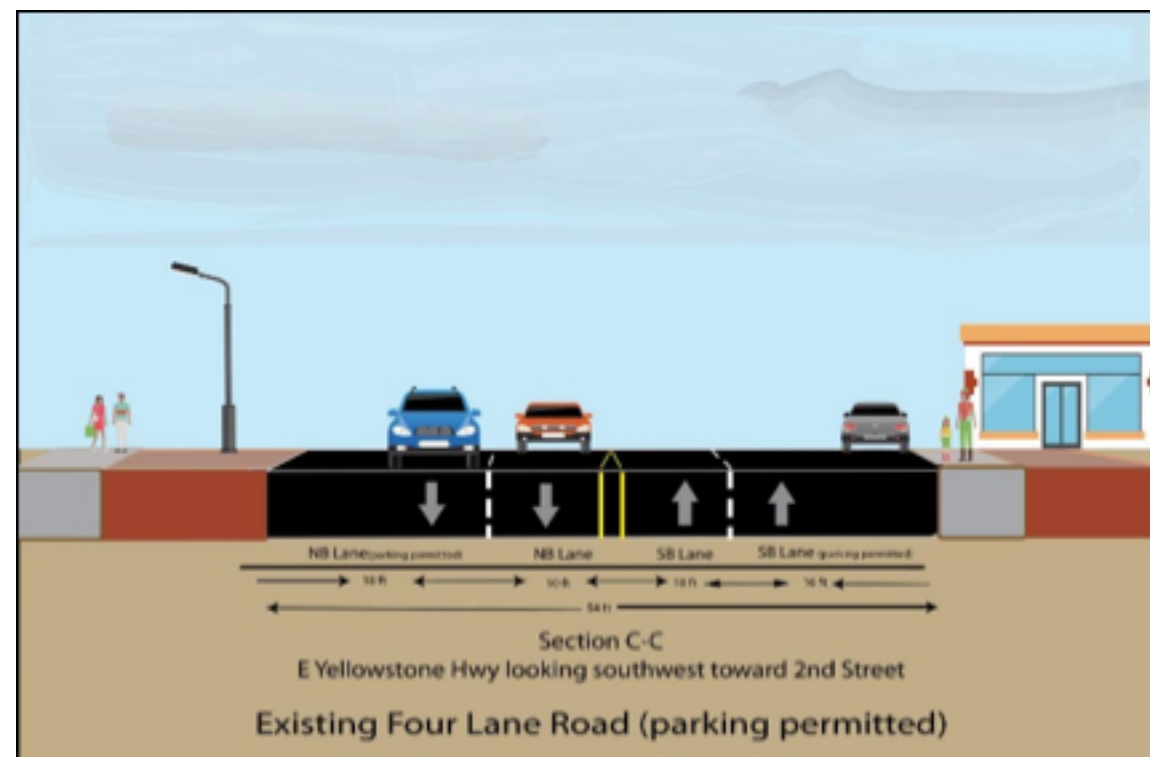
Existing Cross Section – Yellowstone Highway (South of 1st Street)
